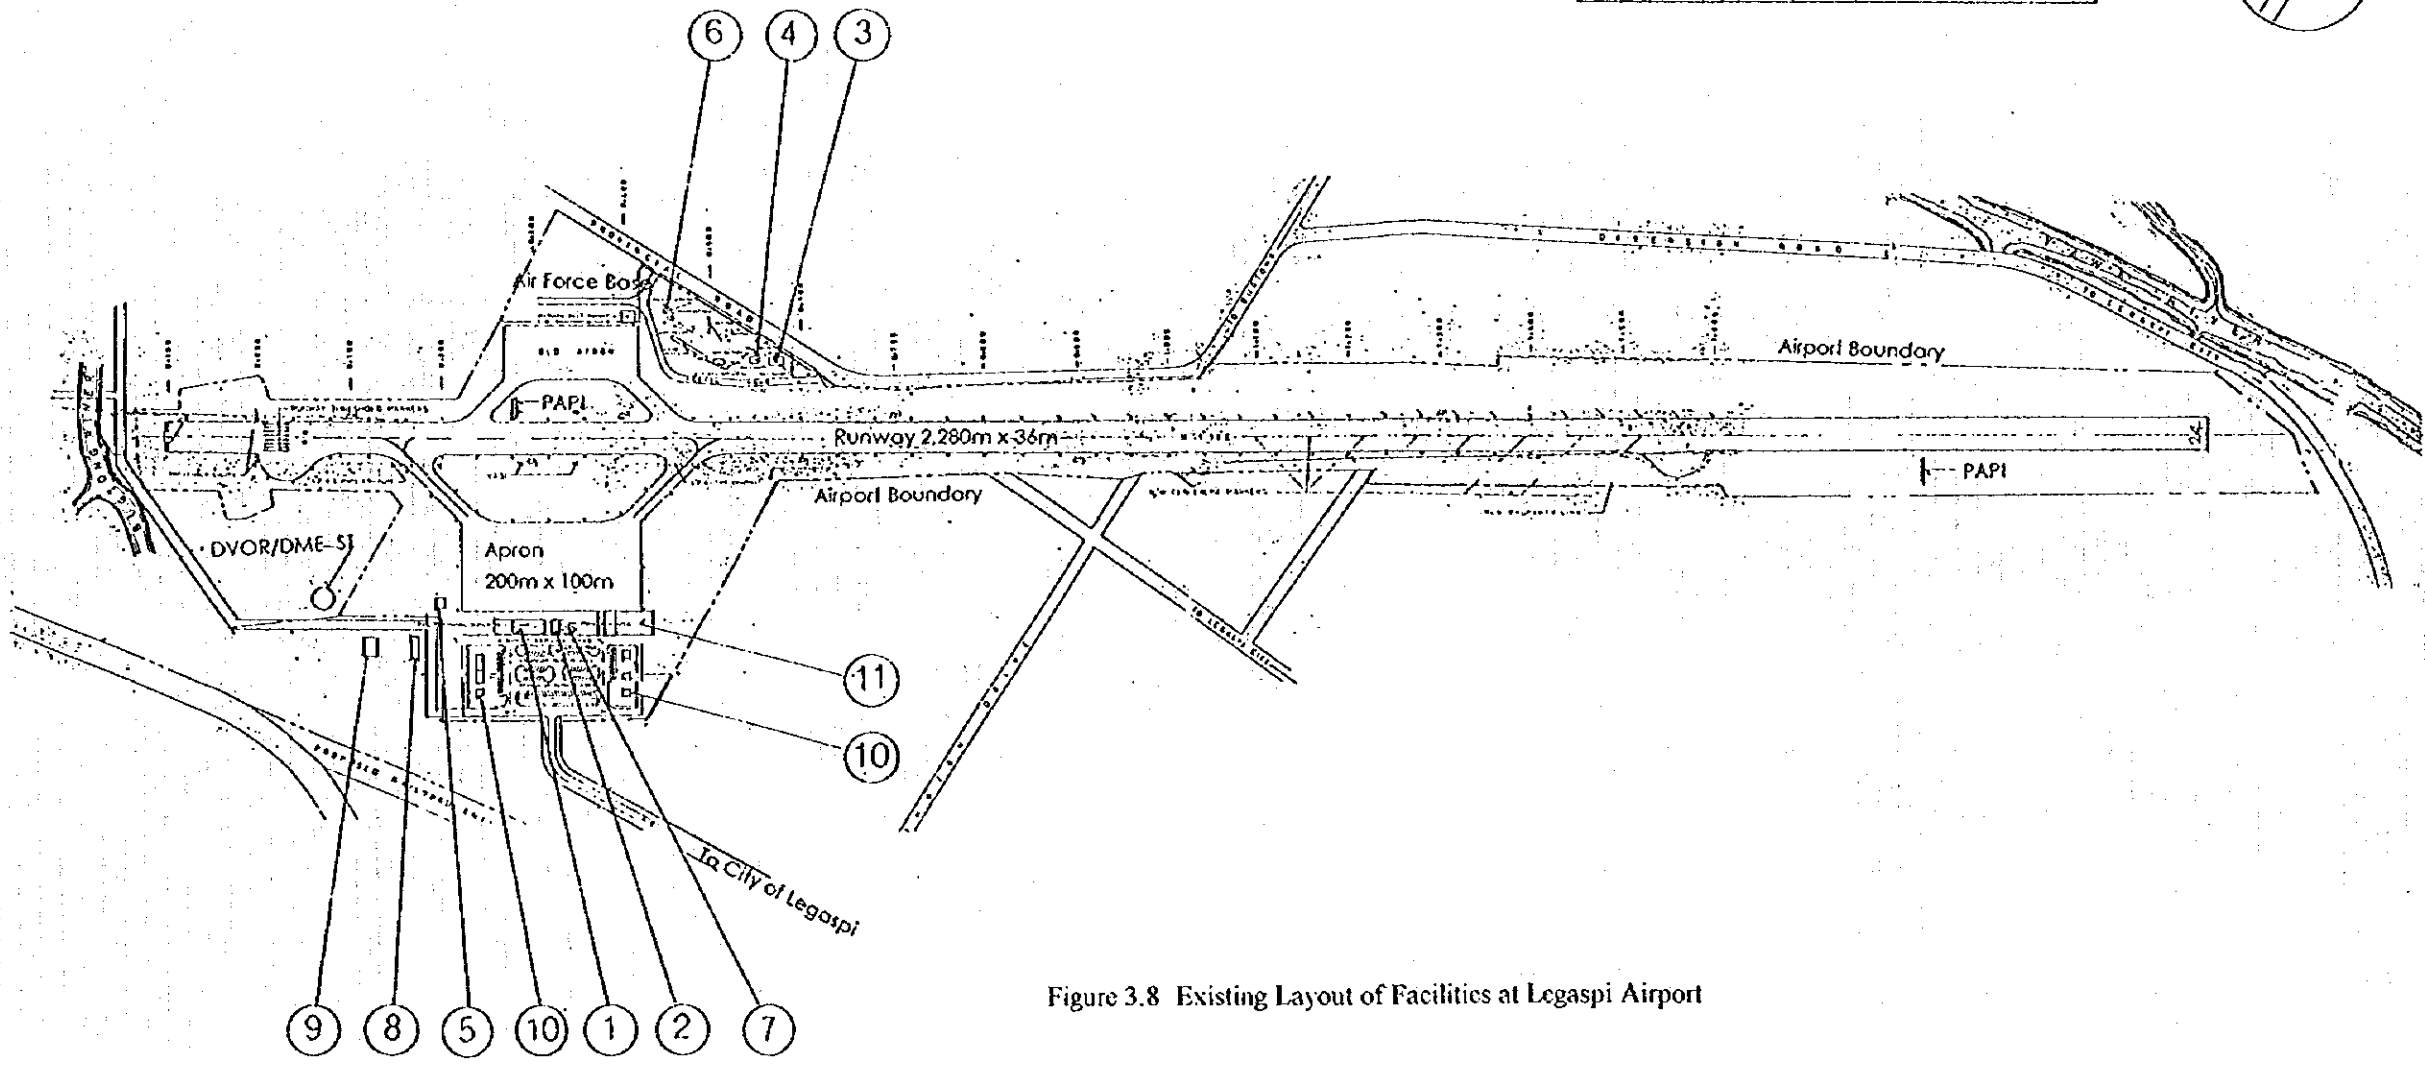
Existing Layout of Facilities at Legaspi Airport
